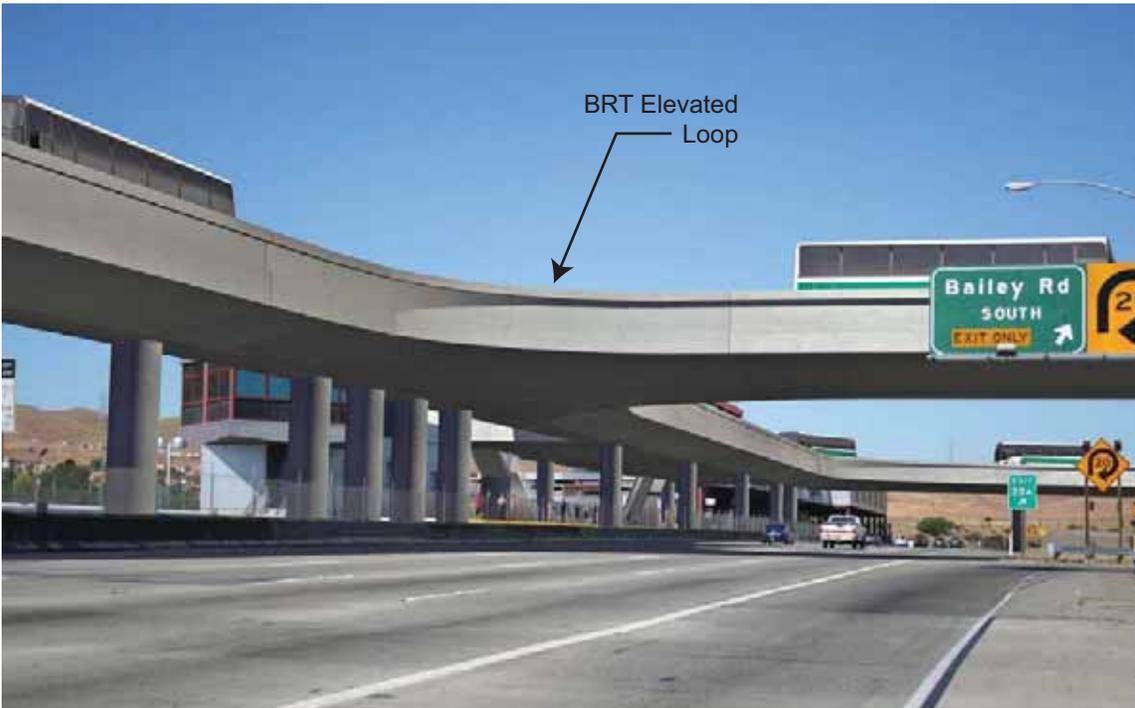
shows an existing view of the Pittsburg/Bay Point BART Station. As shown in this figure, hills beyond to the southwest can be seen intermittently beyond the station buildings and structures. Figure 5-13 also shows a visual simulation of the BRT transfer station and aerial ramps crossing over SR 4. As indicated in the visual simulation, BRT structures would cross over the westbound lanes of SR 4. The new aerial ramps would also close in the gap between the existing Pittsburg/Bay Point BART Station buildings and block some views of the hills from this viewpoint. This portion of SR 4 has been identified as eligible for designation as a State Scenic Highway. Because the Pittsburg/Bay Point BART Station within the SR 4 median includes existing buildings that block views, the addition of the aerial structures under this alternative would not significantly change views of the hills from this viewpoint. Also, no sensitive views are identified along this portion of SR 4.
